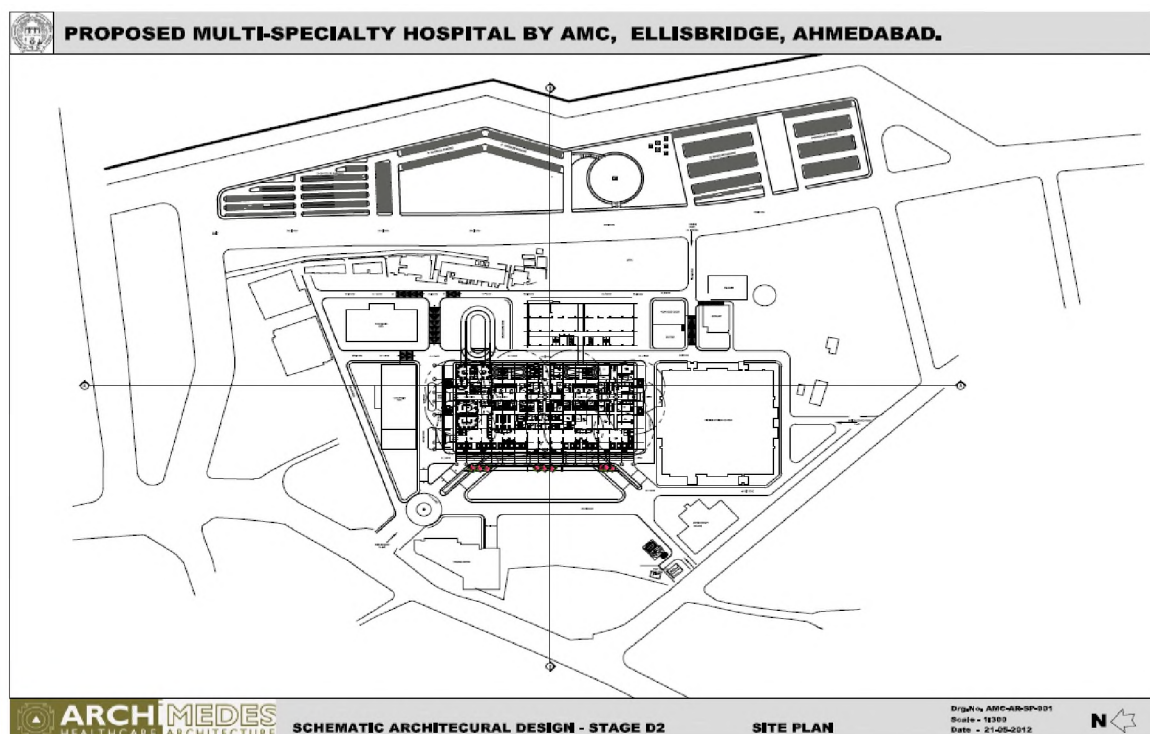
Schematic Architectural Design of proposed building at V. S. Hospital site, Paldi
